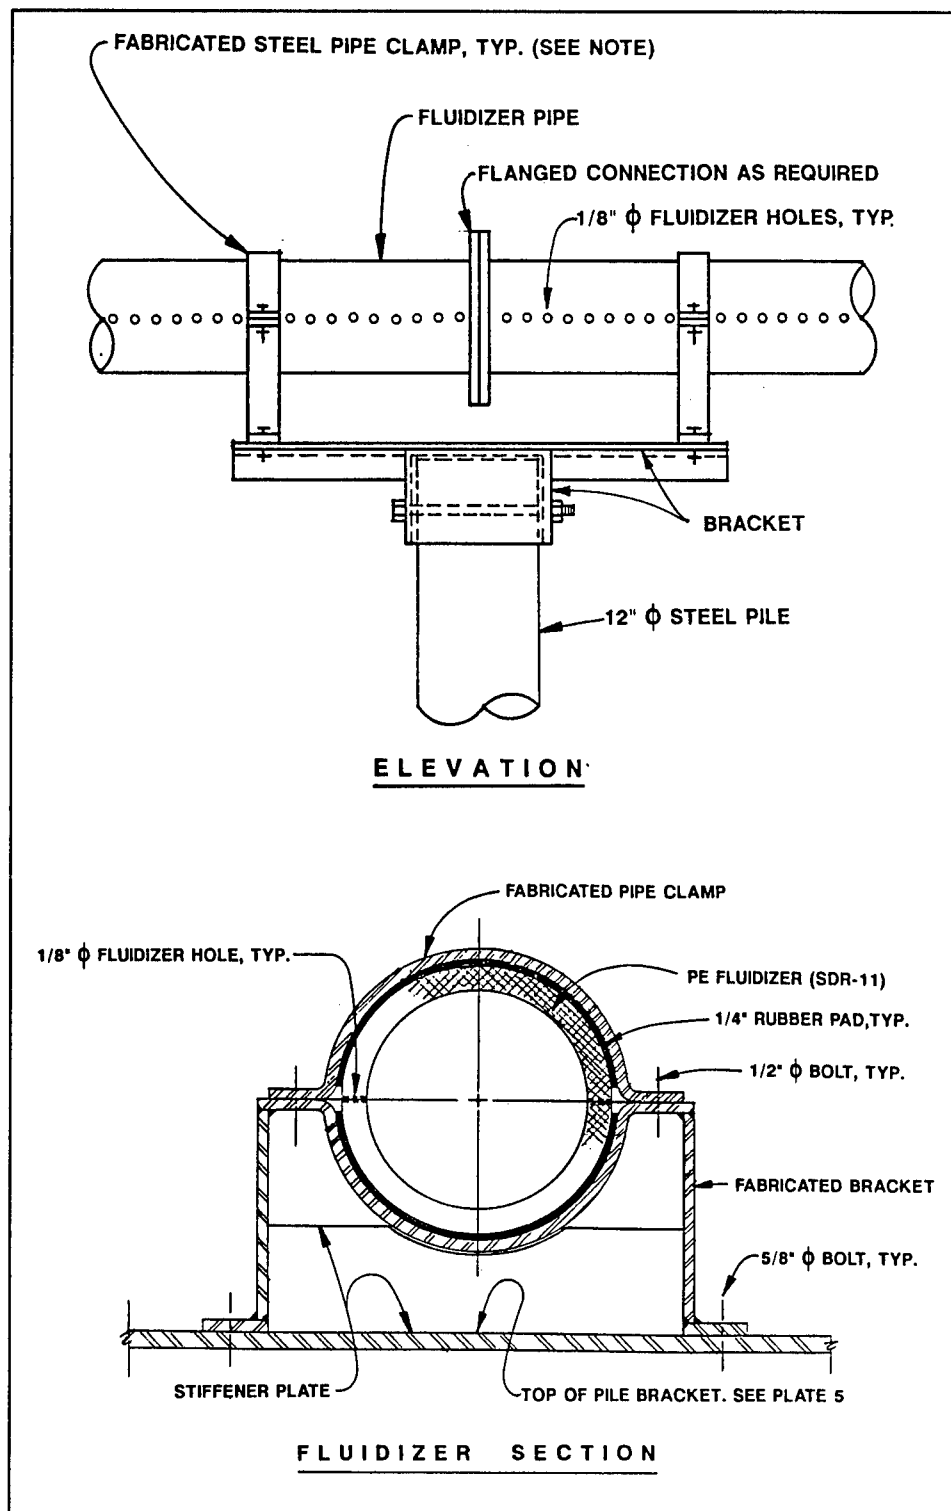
Clamps used to attach fluidizer pipes to support piles (Moffatt and Nichol 1990). Note: drawing is to illustrate concept, and should not be used for design
